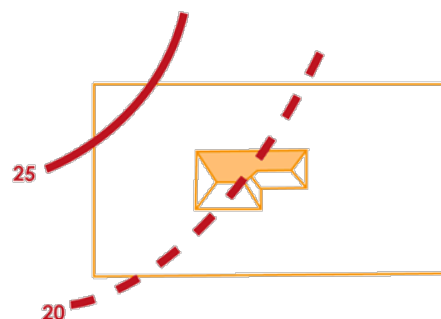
Figure BK: Illustration of Building Site Acceptability based on ANEF Zone
